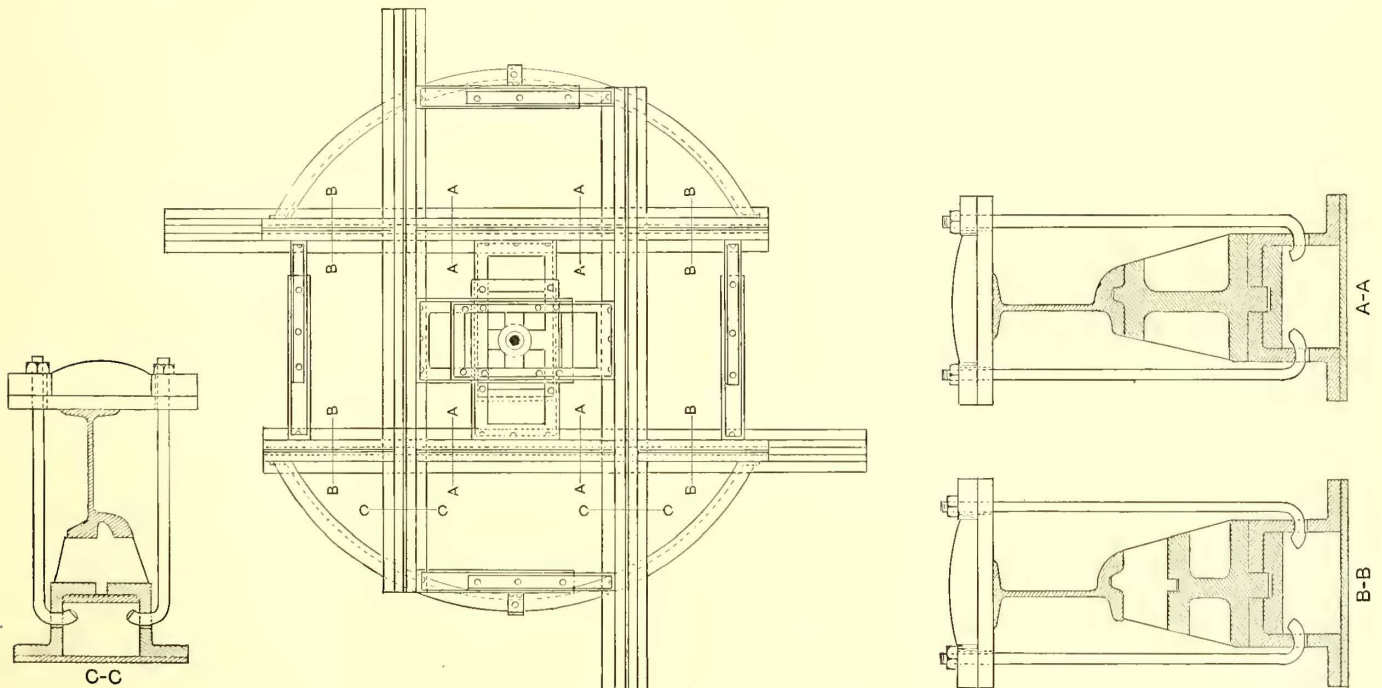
PLAN AND SECTIONS OF CROSSING CLAMP
